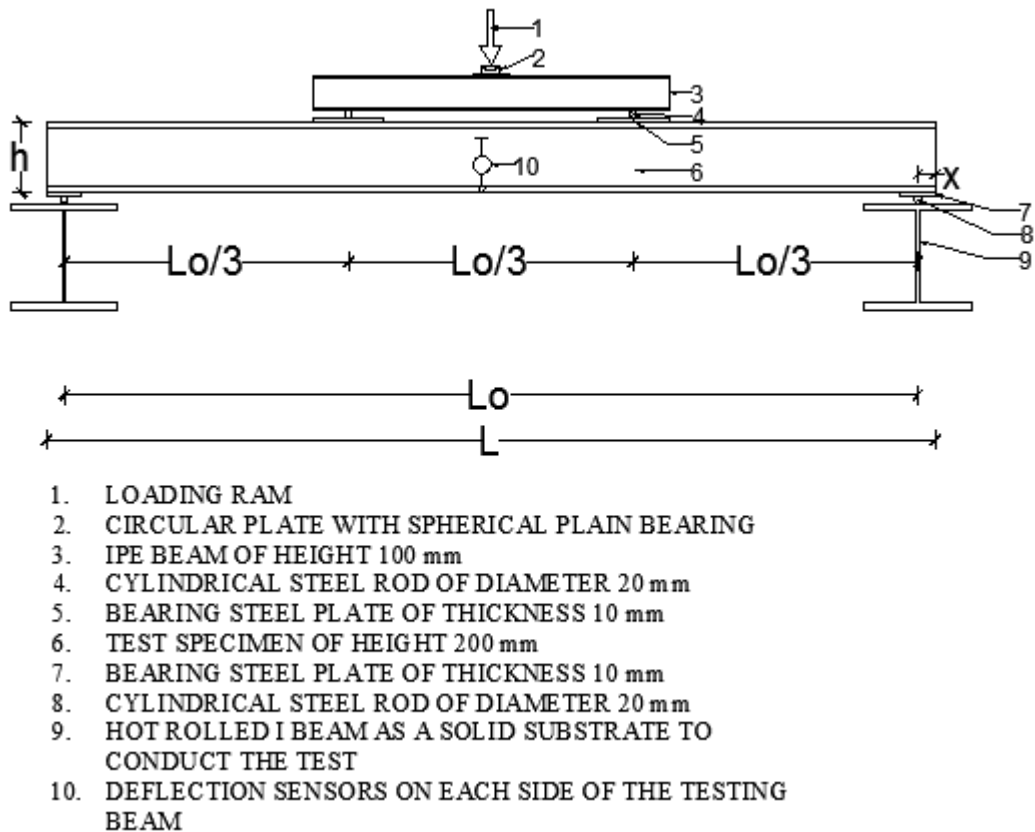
Basic test setup with numbering of all involved parts and devices during the test
